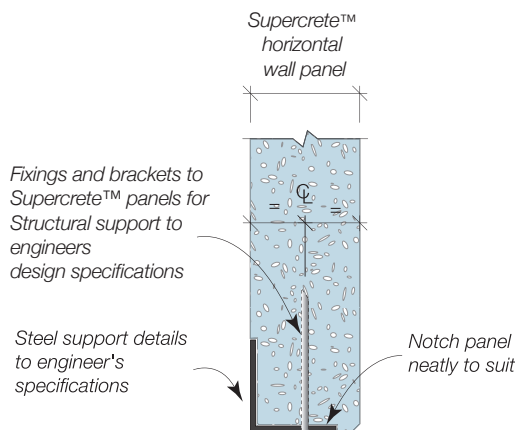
Horizontal wall panel & concrete base support junction detail.
